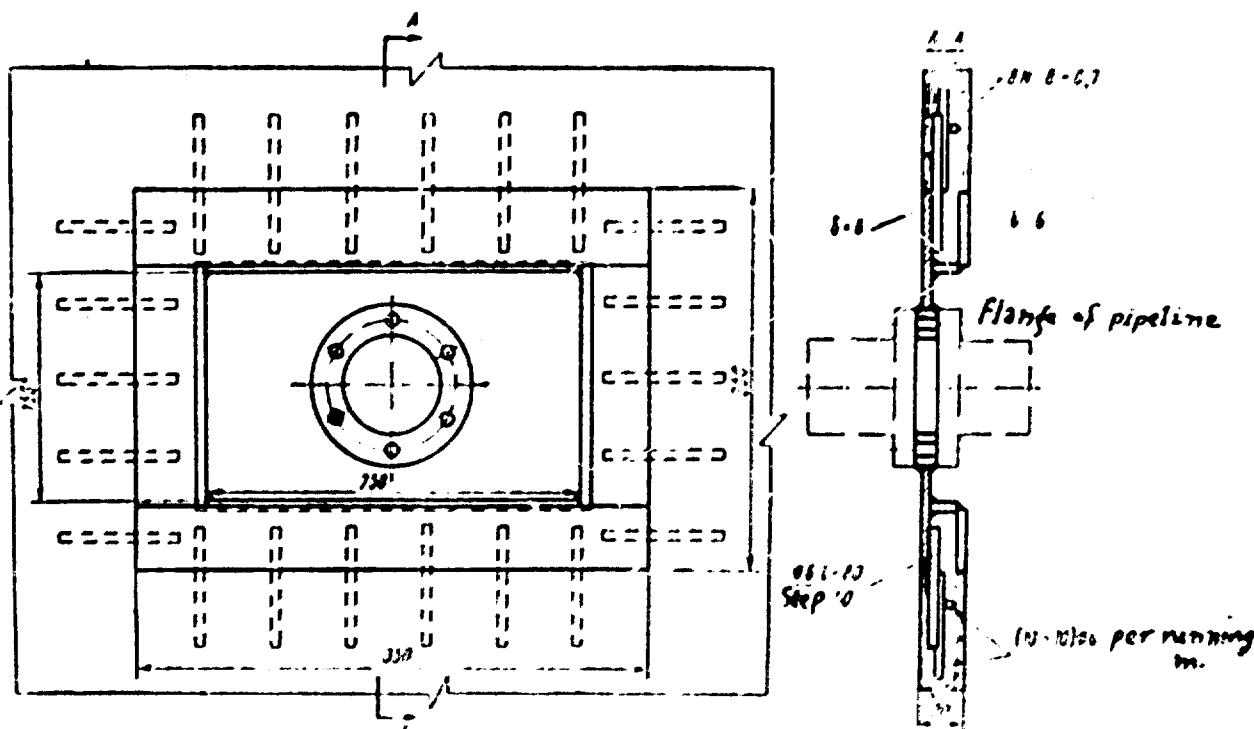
Attachment of Pipeline Which Intersects the Plates of Reinforced Concrete Sheathing.
